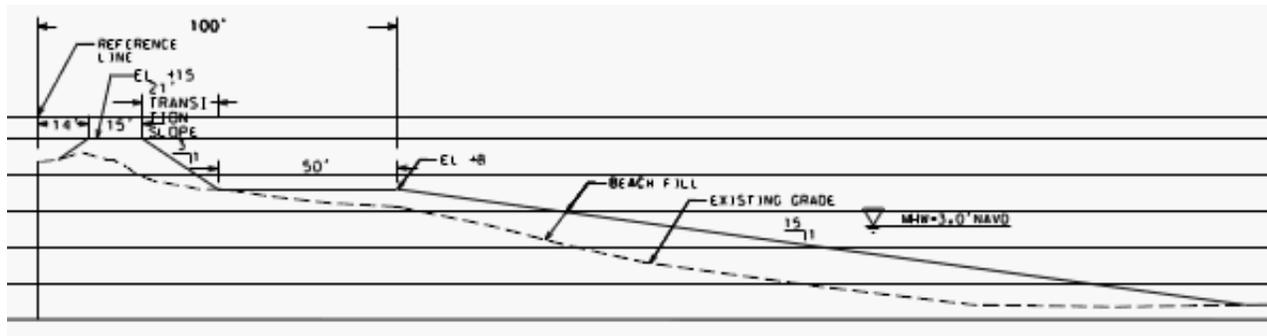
Typical Dune and Beachfill Sta.11+00 to Sta.61+00
